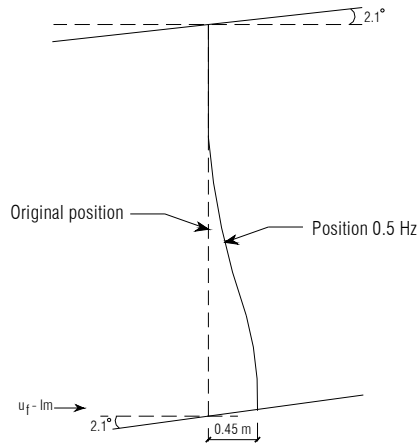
Vibration of a typical pile-pier system at the Yanagizawa bridge.
